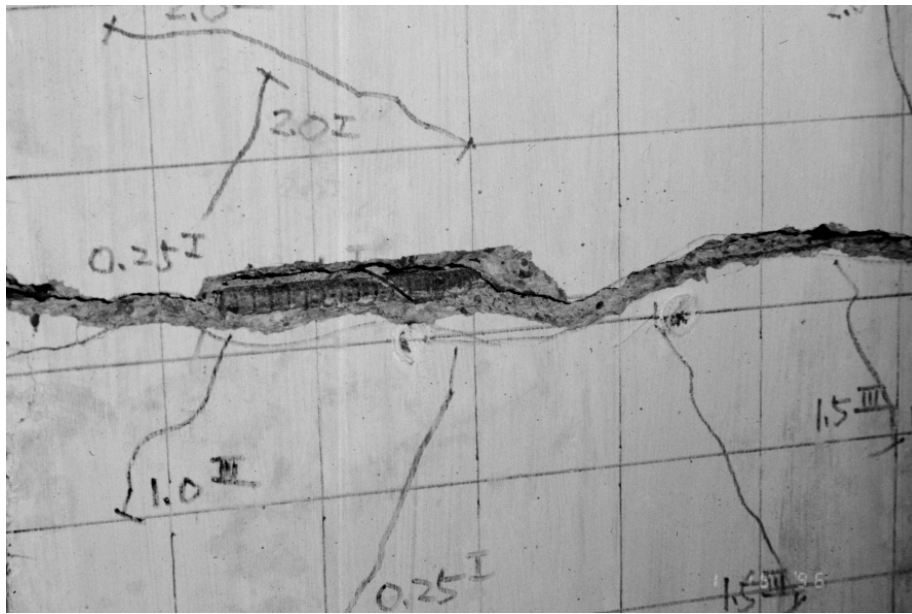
Crack Opening at the Top of Splice Sleeves (Specimen PC1)
